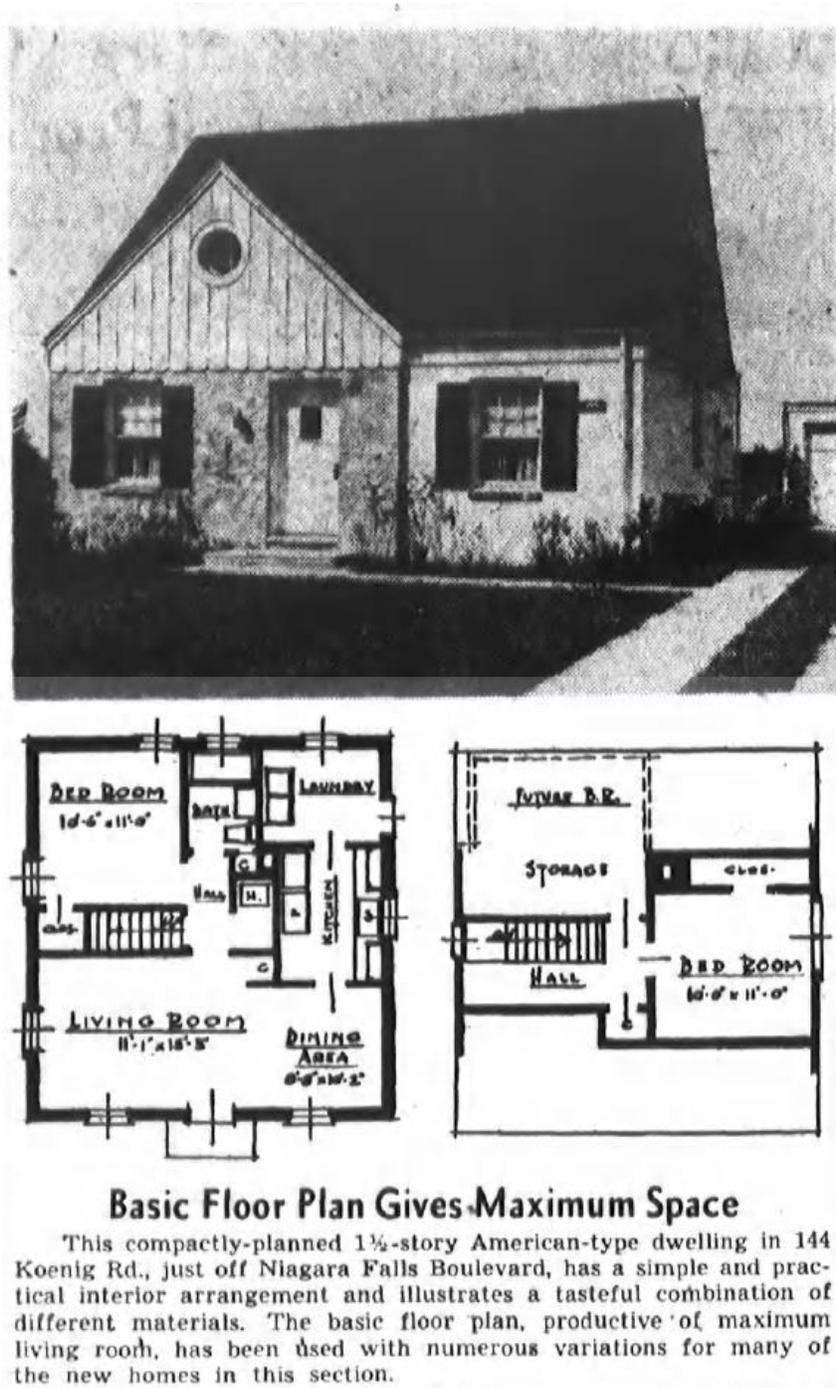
Photo and Floor Plan for a Minimal Traditional House on Koenig Road in Tonawanda from Buffalo Evening News, Real Estate Section, August 30, 1941.
